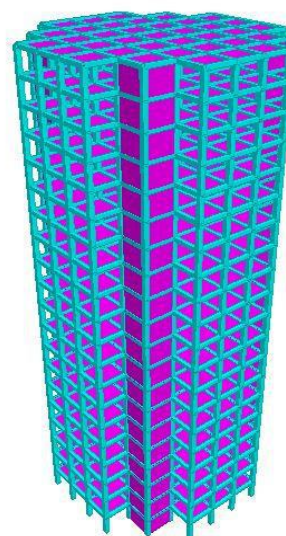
Structure with Simple Rectangular type Shear Wall at Corner
